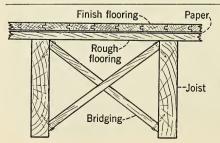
The joists are stronger when set on edge. They must be cross-braced, however, to prevent the floor from vibrating.
